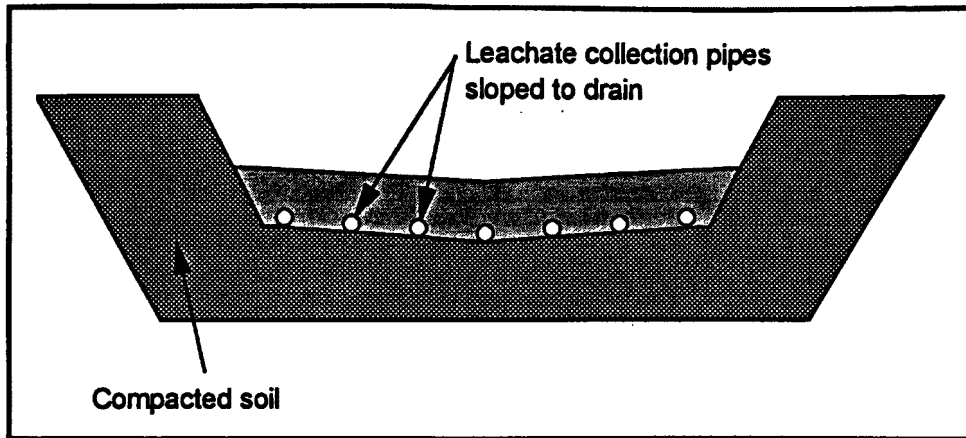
Example of a Single-Liner System with Leachate Collection System Also Shown
